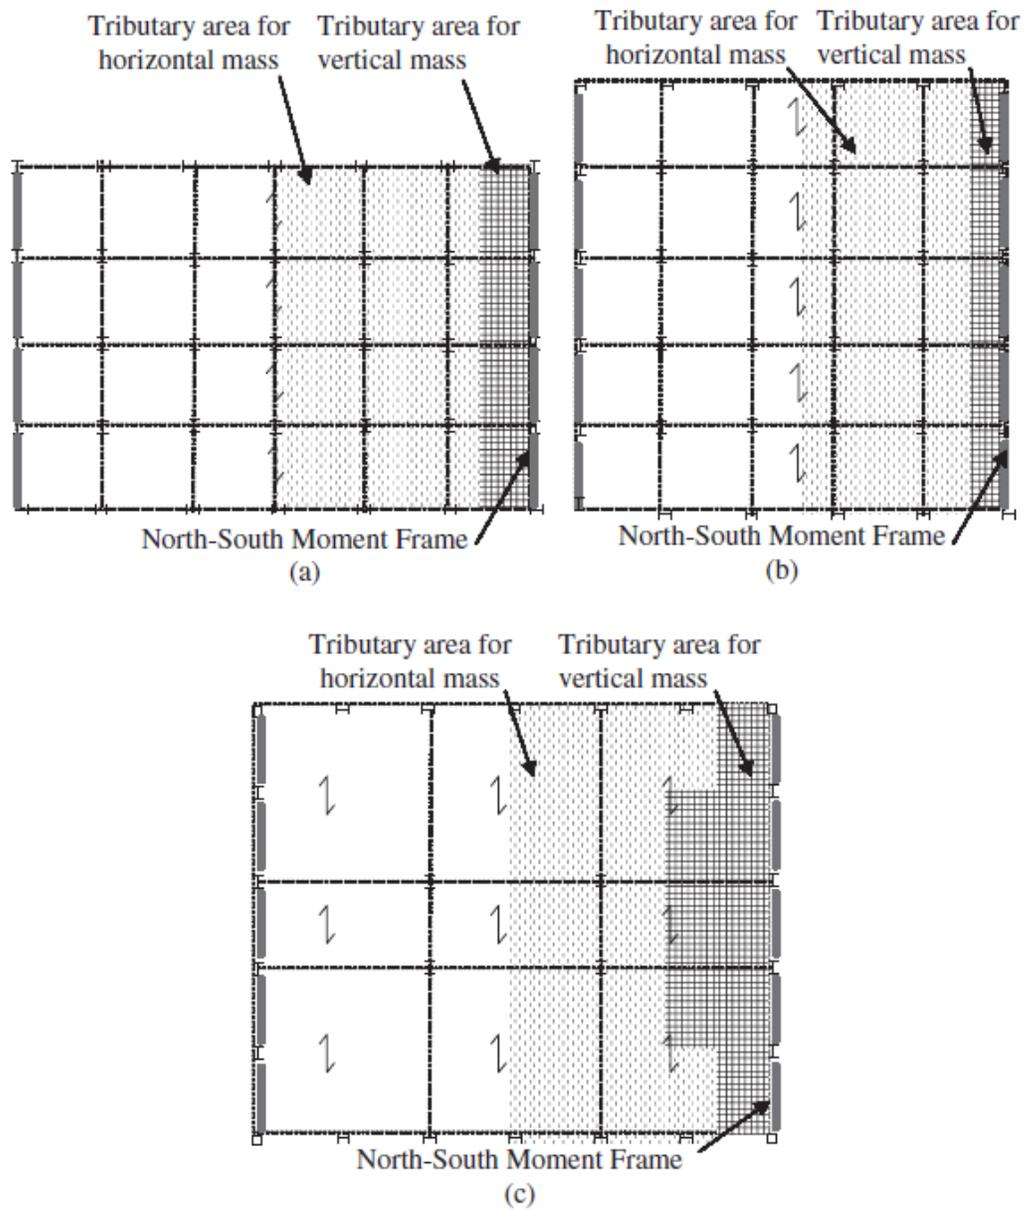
Tributary Areas for Horizontal and Vertical Mass: (a) LA 3-storey SAC building, (b) LA 9-storey SAC building, (c) LA 20-storey SAC building (Whalen, Archer, & Bhatia, 2004)
